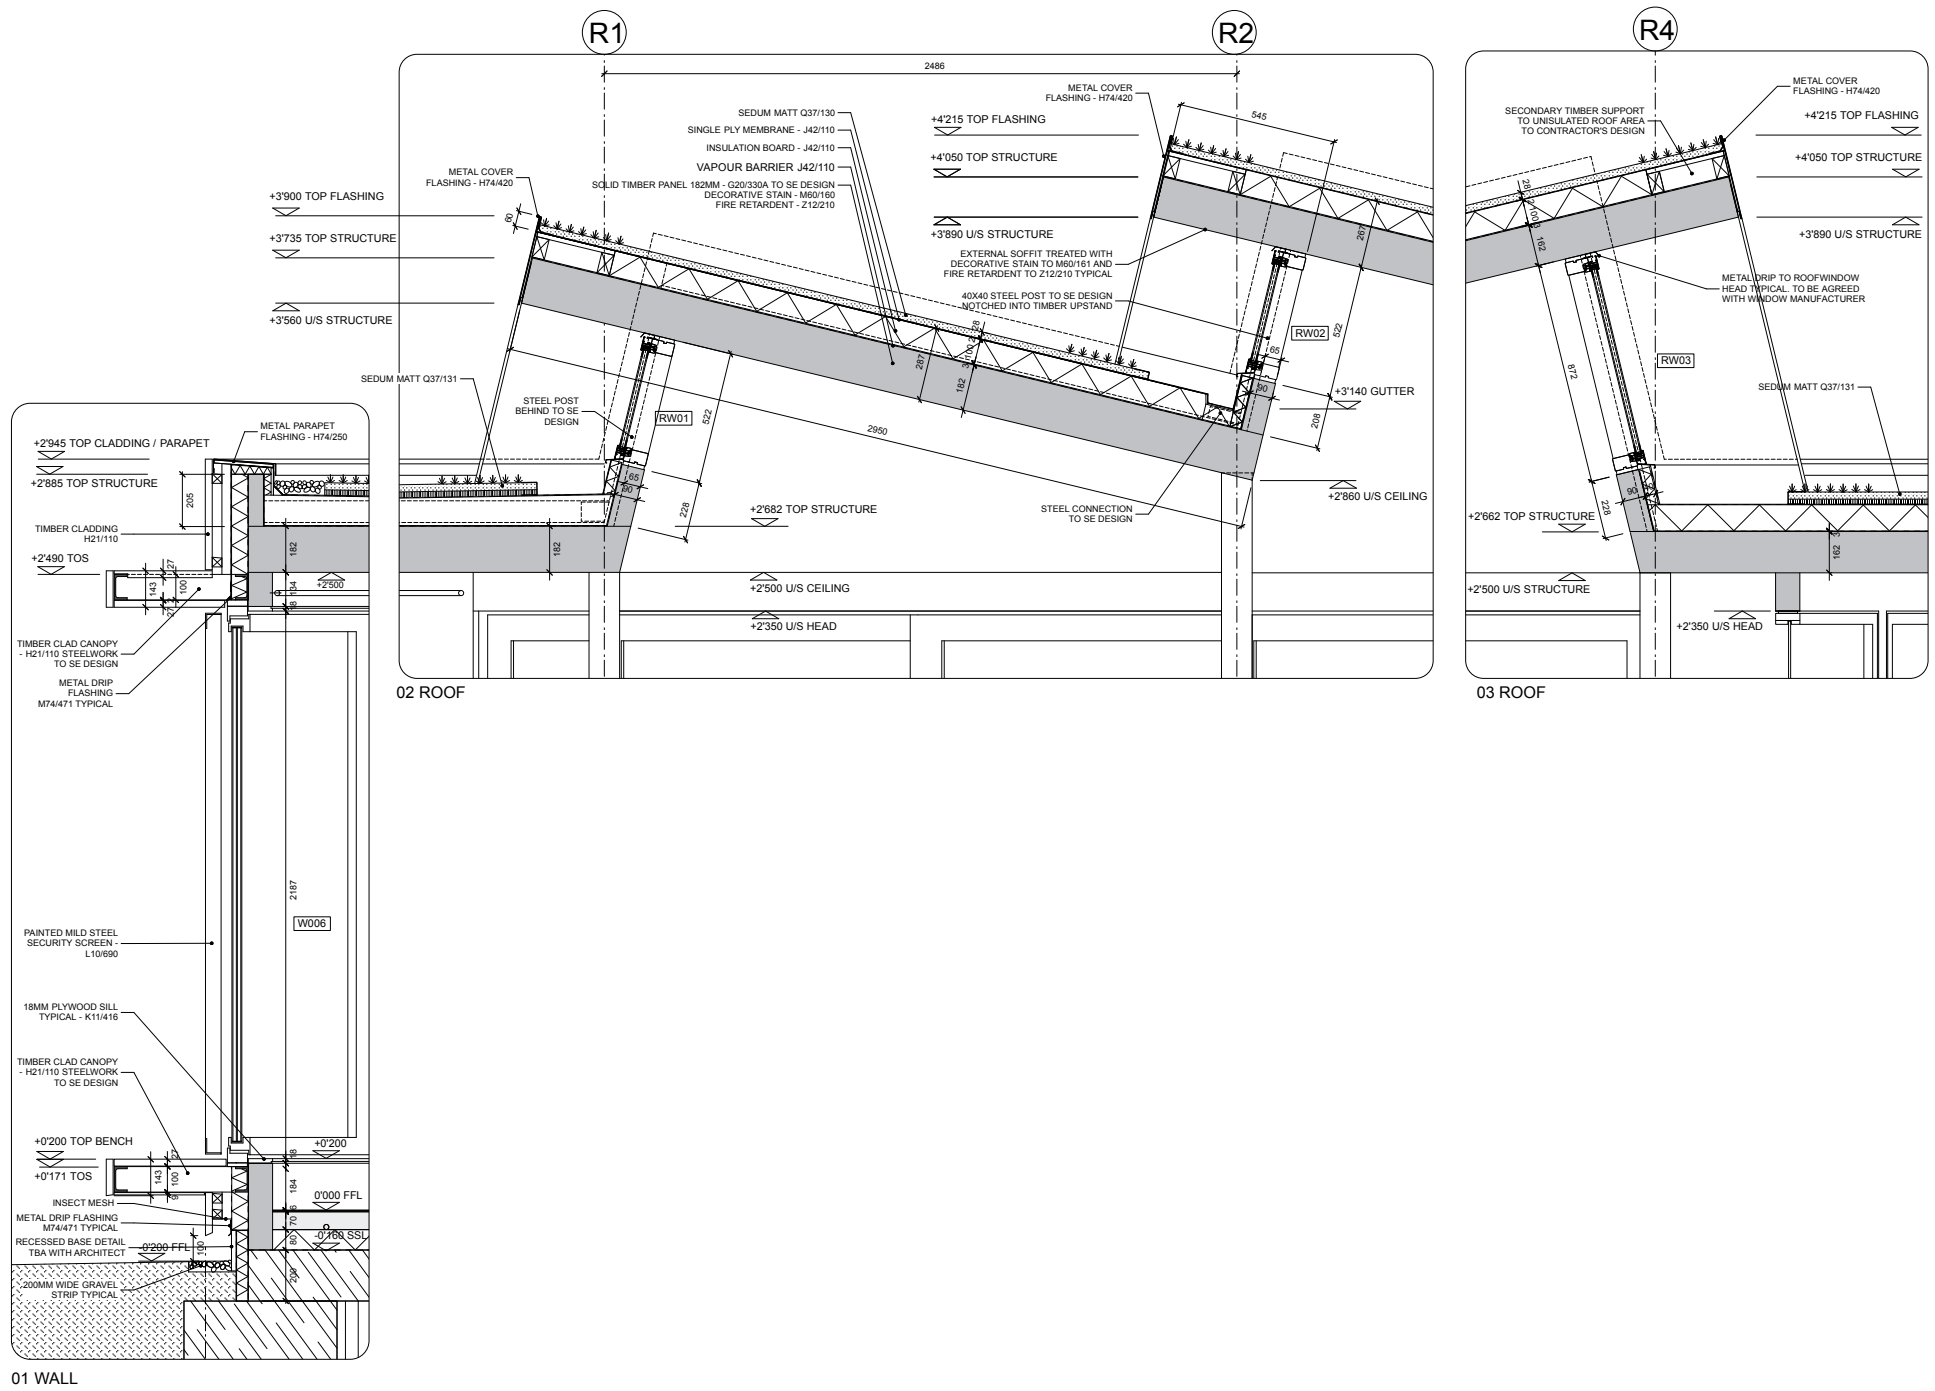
Detail Roof Section, showing opening window sections and roof construction
